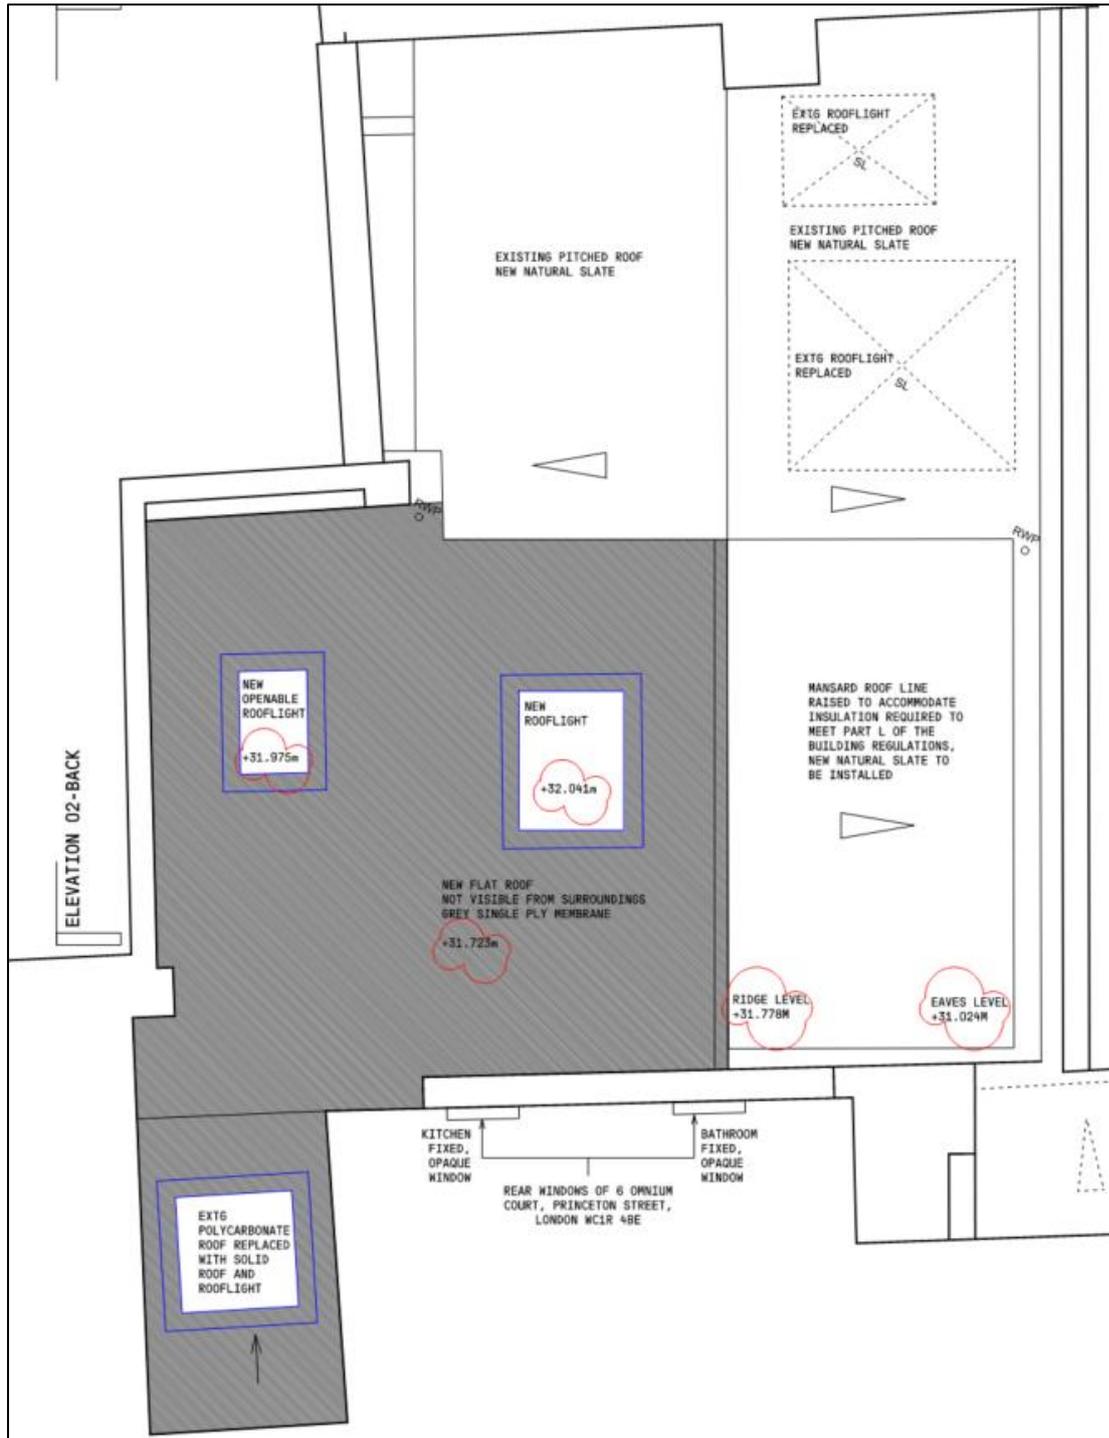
As-built roof plan. Location of existing rear facing windows on Omnium Court annotated.
